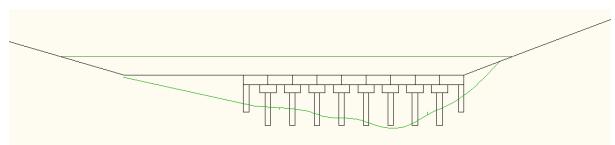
Proposed cross section of the second option for Jack Parr Bridge Replacement.
